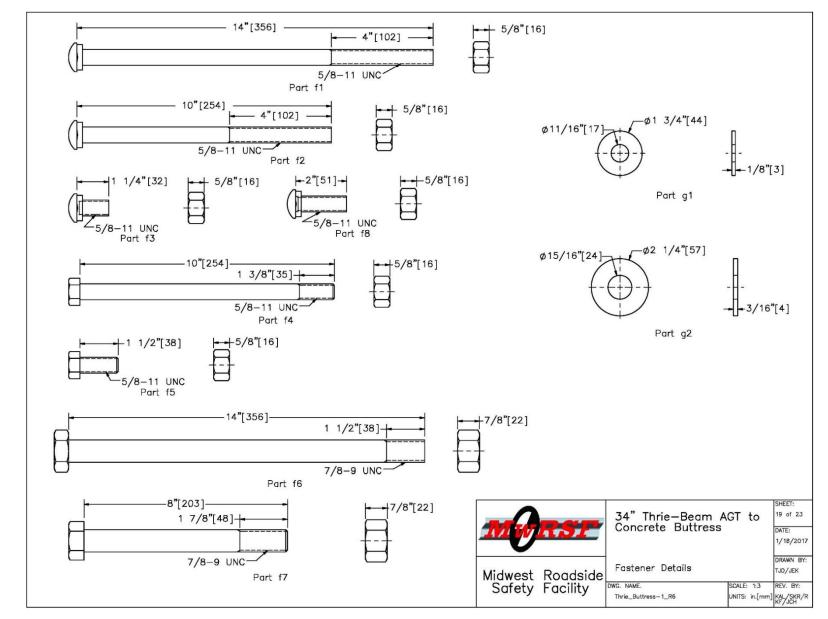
Fastener Details, Test Nos. 34AGT-1 and 34AGT-2
